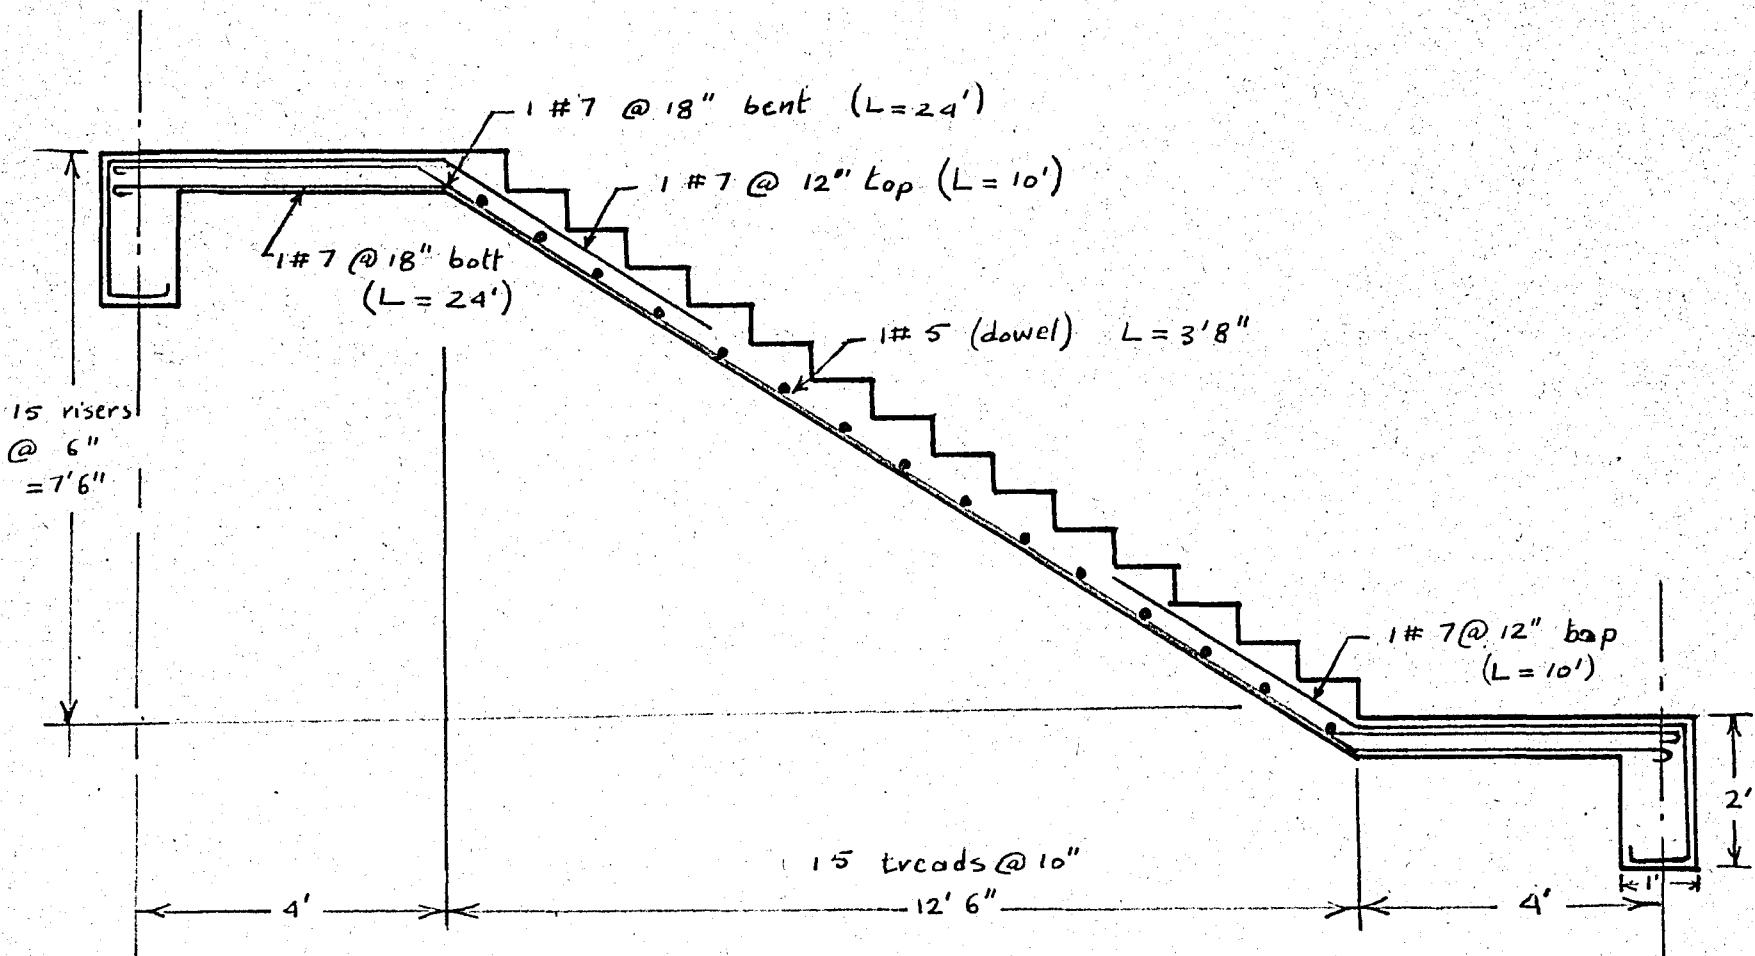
Stair Slab - Steel Reinforcement (Scale 1 ft = 1 cm.)
